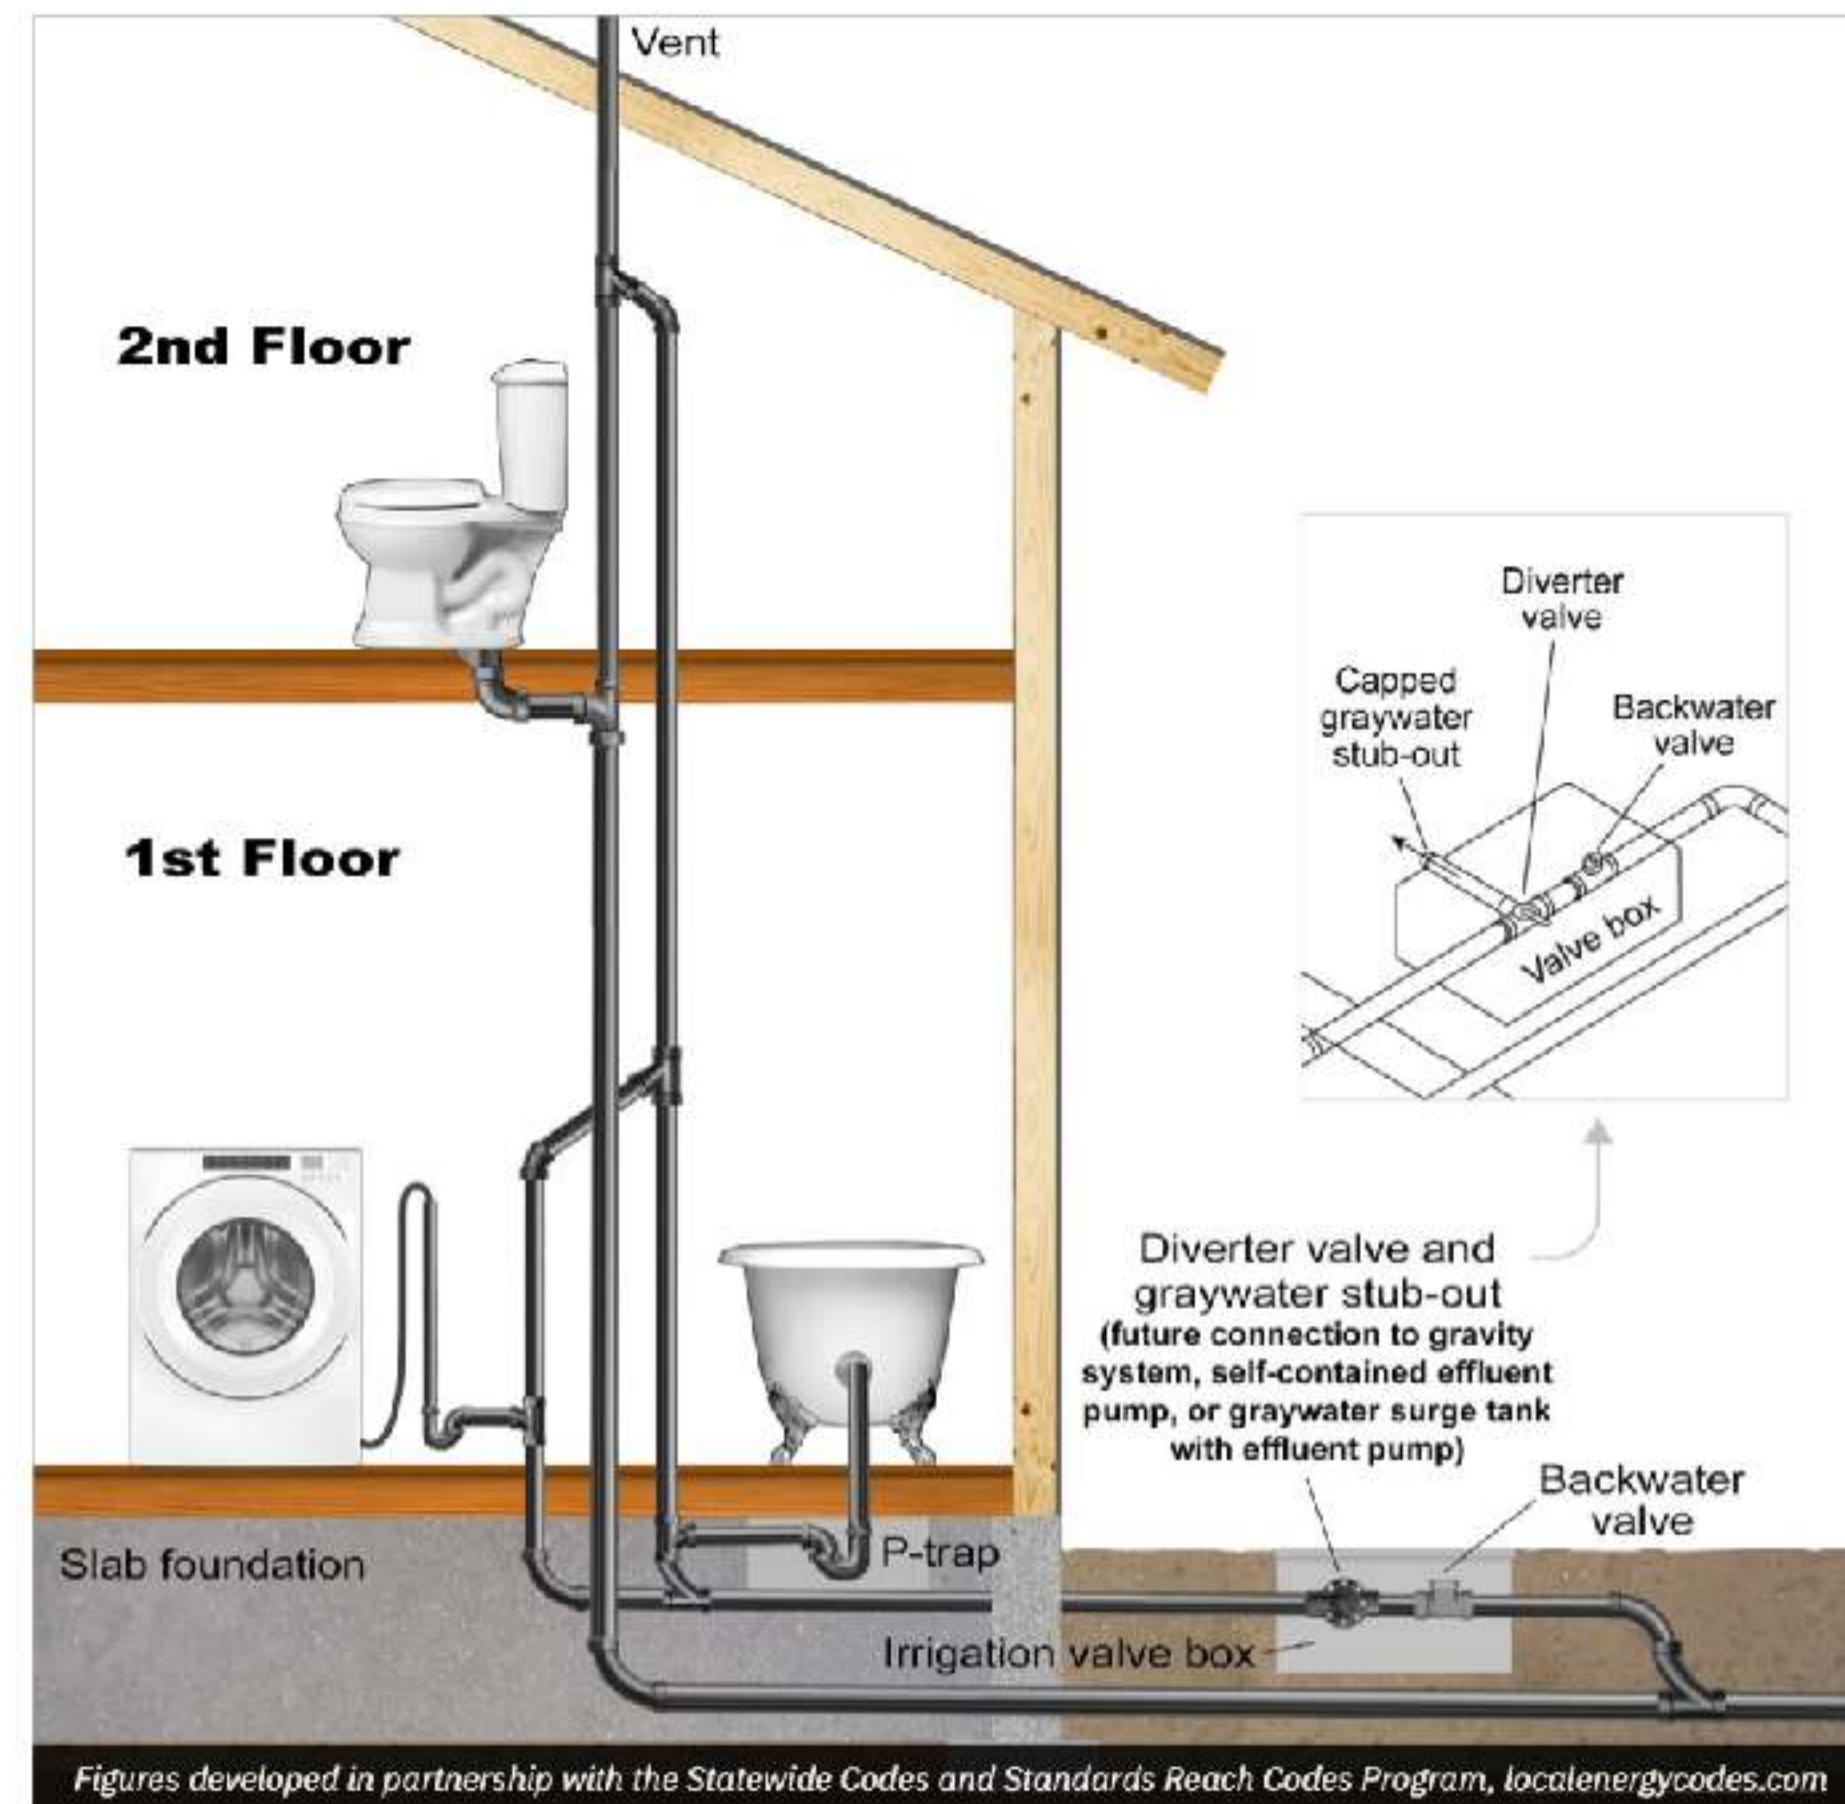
Dual Drainage Plumbing: Multiple fixtures on concrete slab foundation
